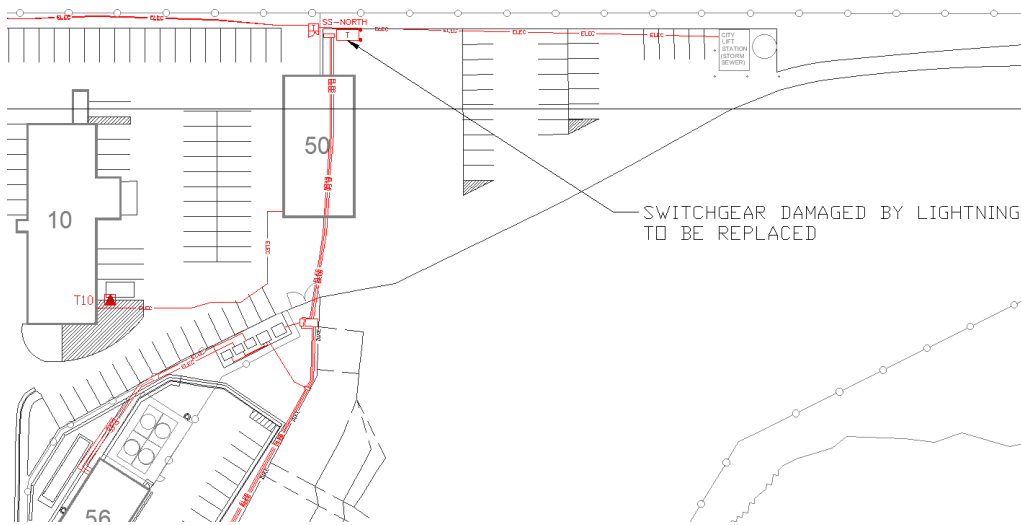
Fargo VA Site Plan – Damaged Switchgear Location
